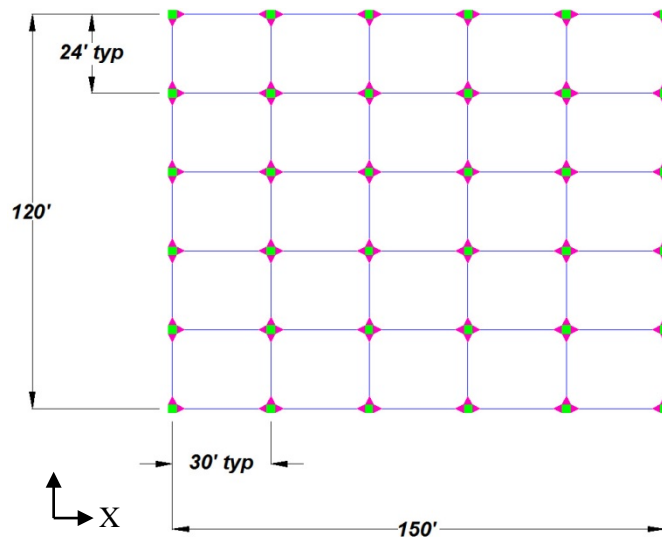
Prototype Building Plan View illustrated for concrete buildings.
